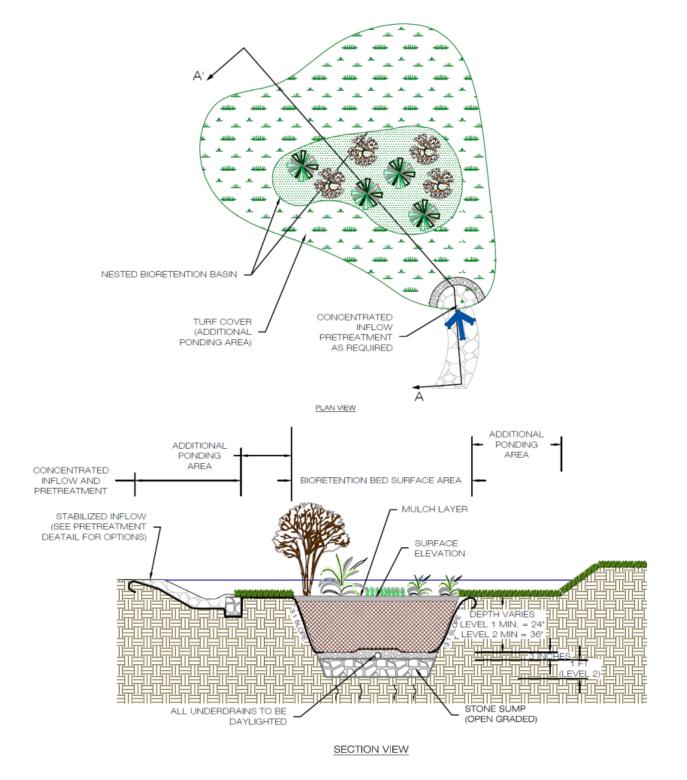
Typical Detail of Bioretention with Additional Surface Ponding
